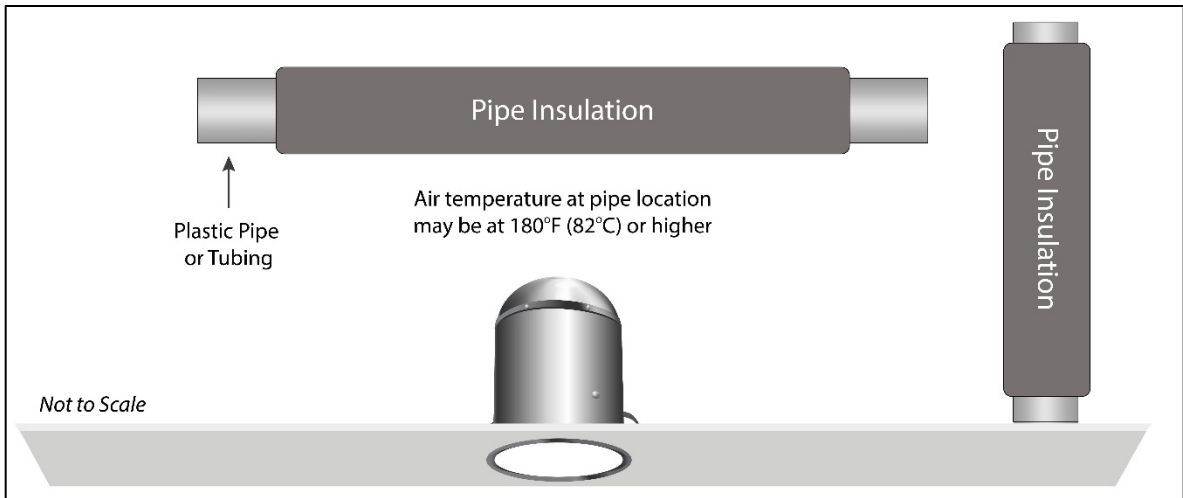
Protecting plastic pipe or tubing against excessive air temperature with approved insulation
